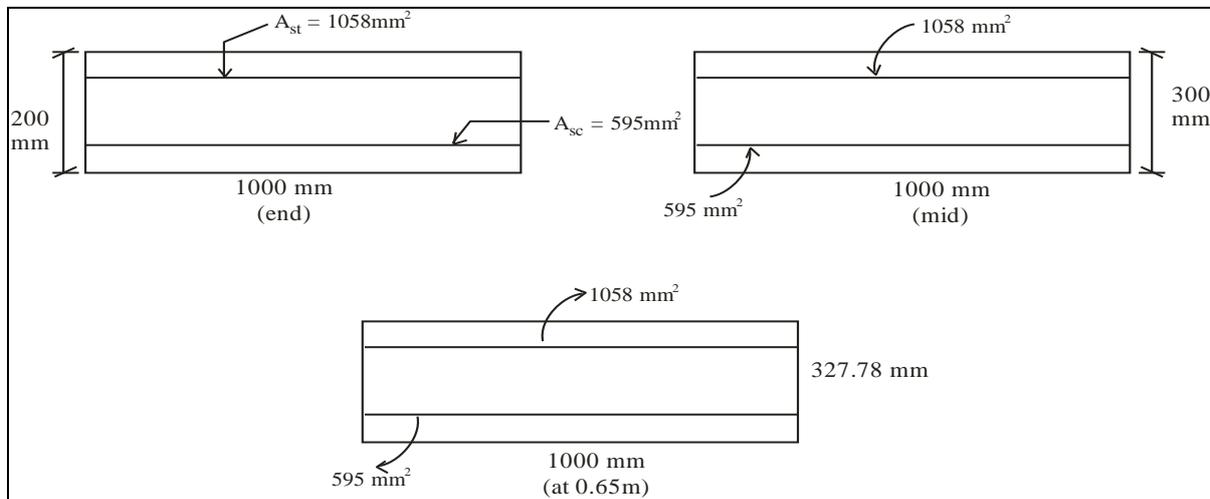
Area of Reinforcement in Different Section of Cantilever Slab (SP-34).
